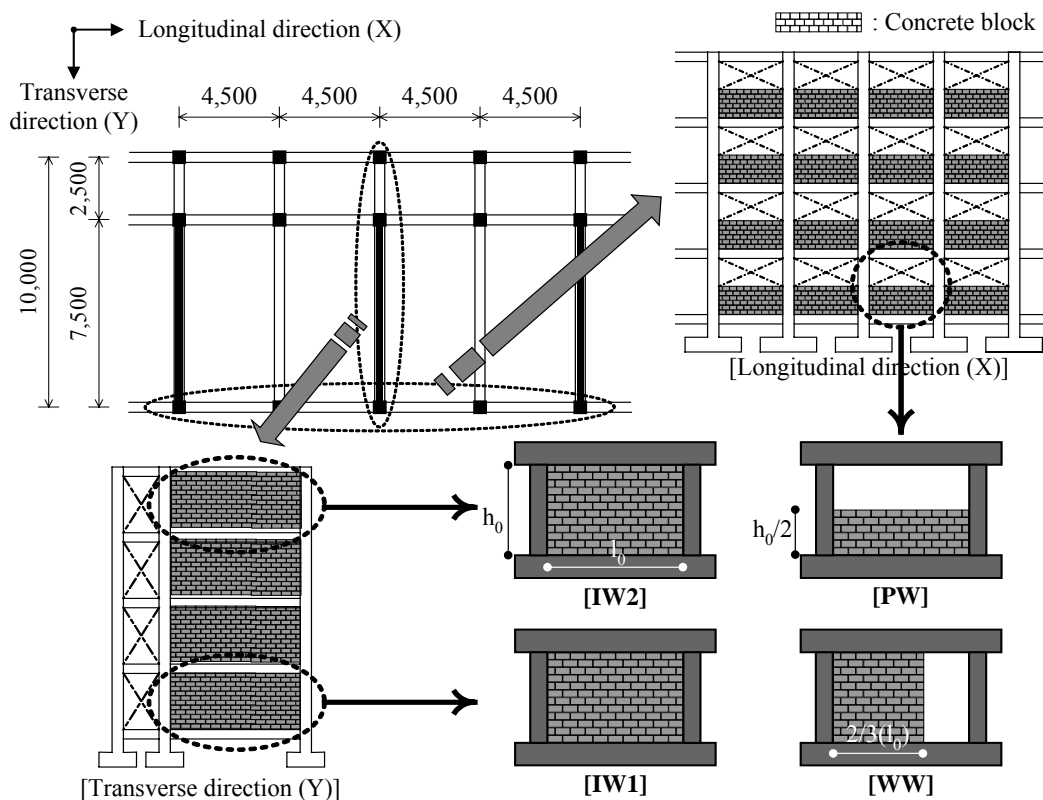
Standard design of Korean school buildings in the 1980s and specimen plan
